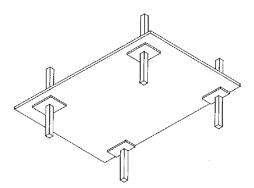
VIEW OF FLAT SLAB WITH DROP PANELS
